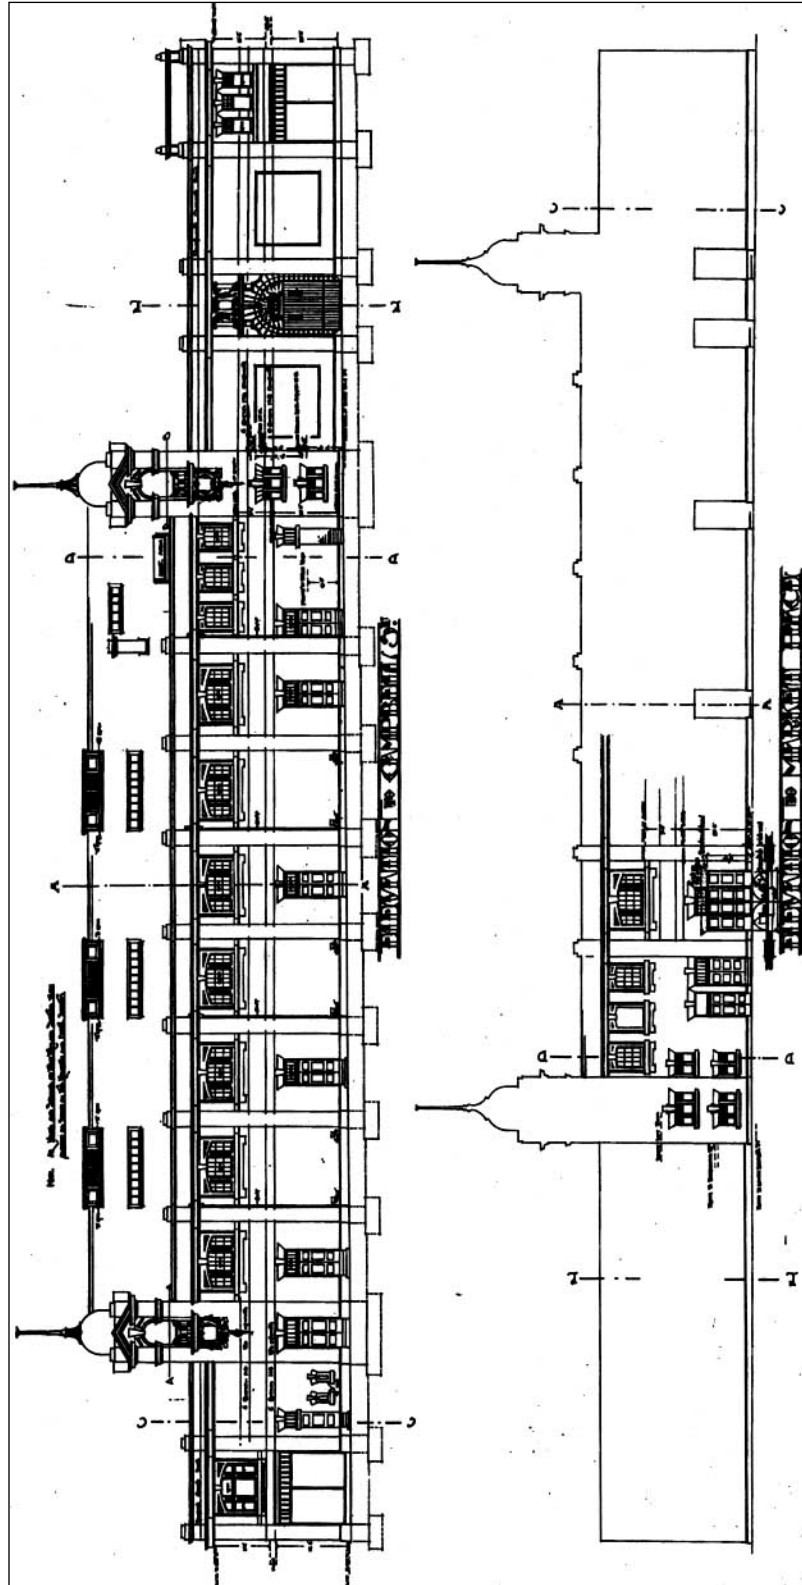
Campbell Street and Market Place elevations in 1914 (HCC Drawing A7²). Note the roof vents (cf figures 8 & 9 and see section 3.0).
